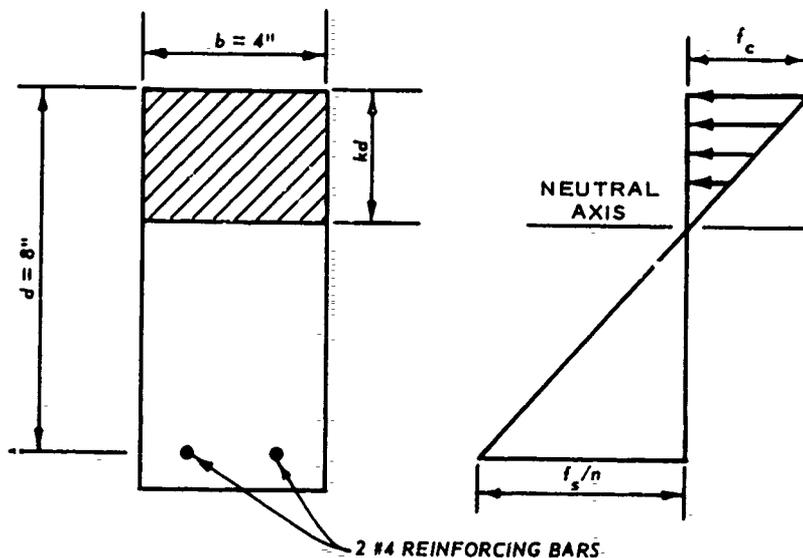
Flexural reinforcement and assumed stress distribution of beam 1
